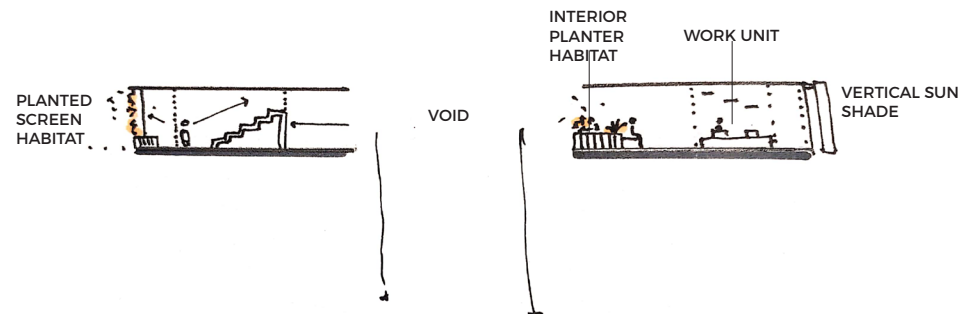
CONCEPTUAL SECTION SECOND FLOOR (AUTHOR 2021)
